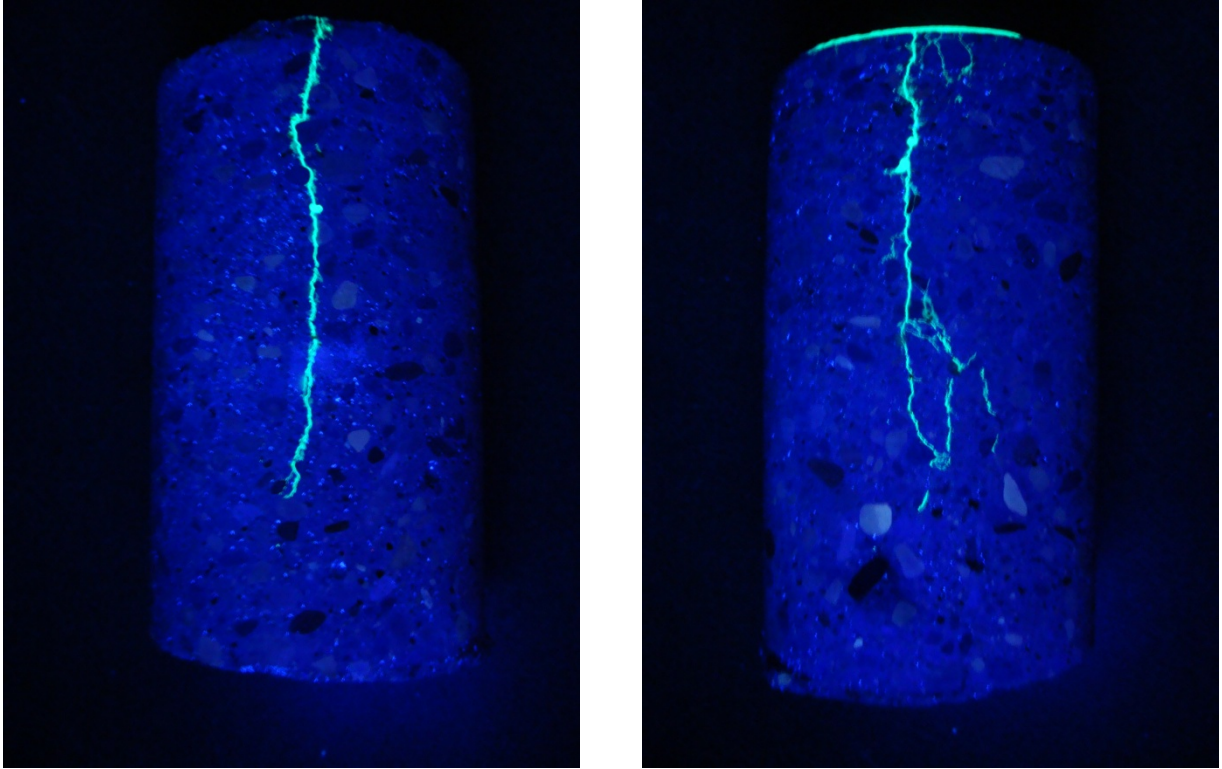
Core TS2 (left) west elevation; (right) east elevation
